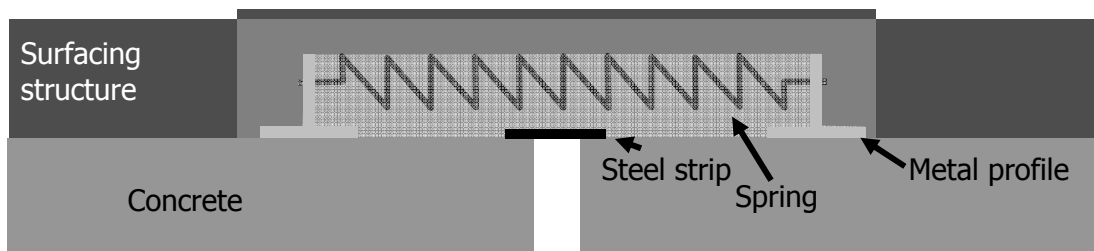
Cross section of the Prefab Silent Joint system (not to scale).
